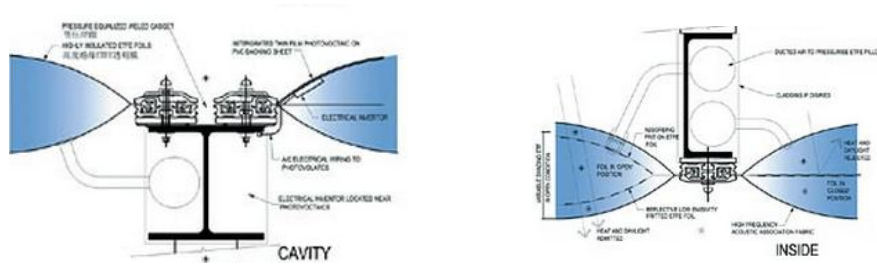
Typical structural system and connections of the system (extracted from ARCHITEN¹¹²)
